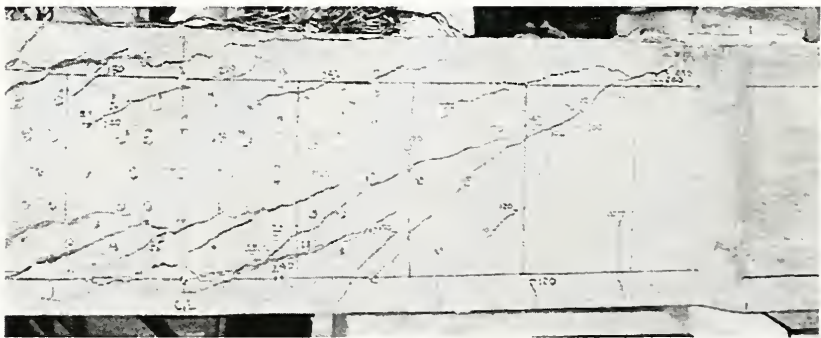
Specimen 12-NWHD at Failure (North Test Region)
